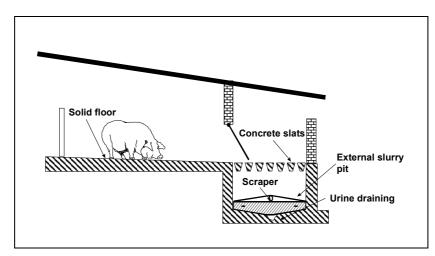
Solid concrete floor with slatted external alley and scraper underneath [59, Italy, 1999]
